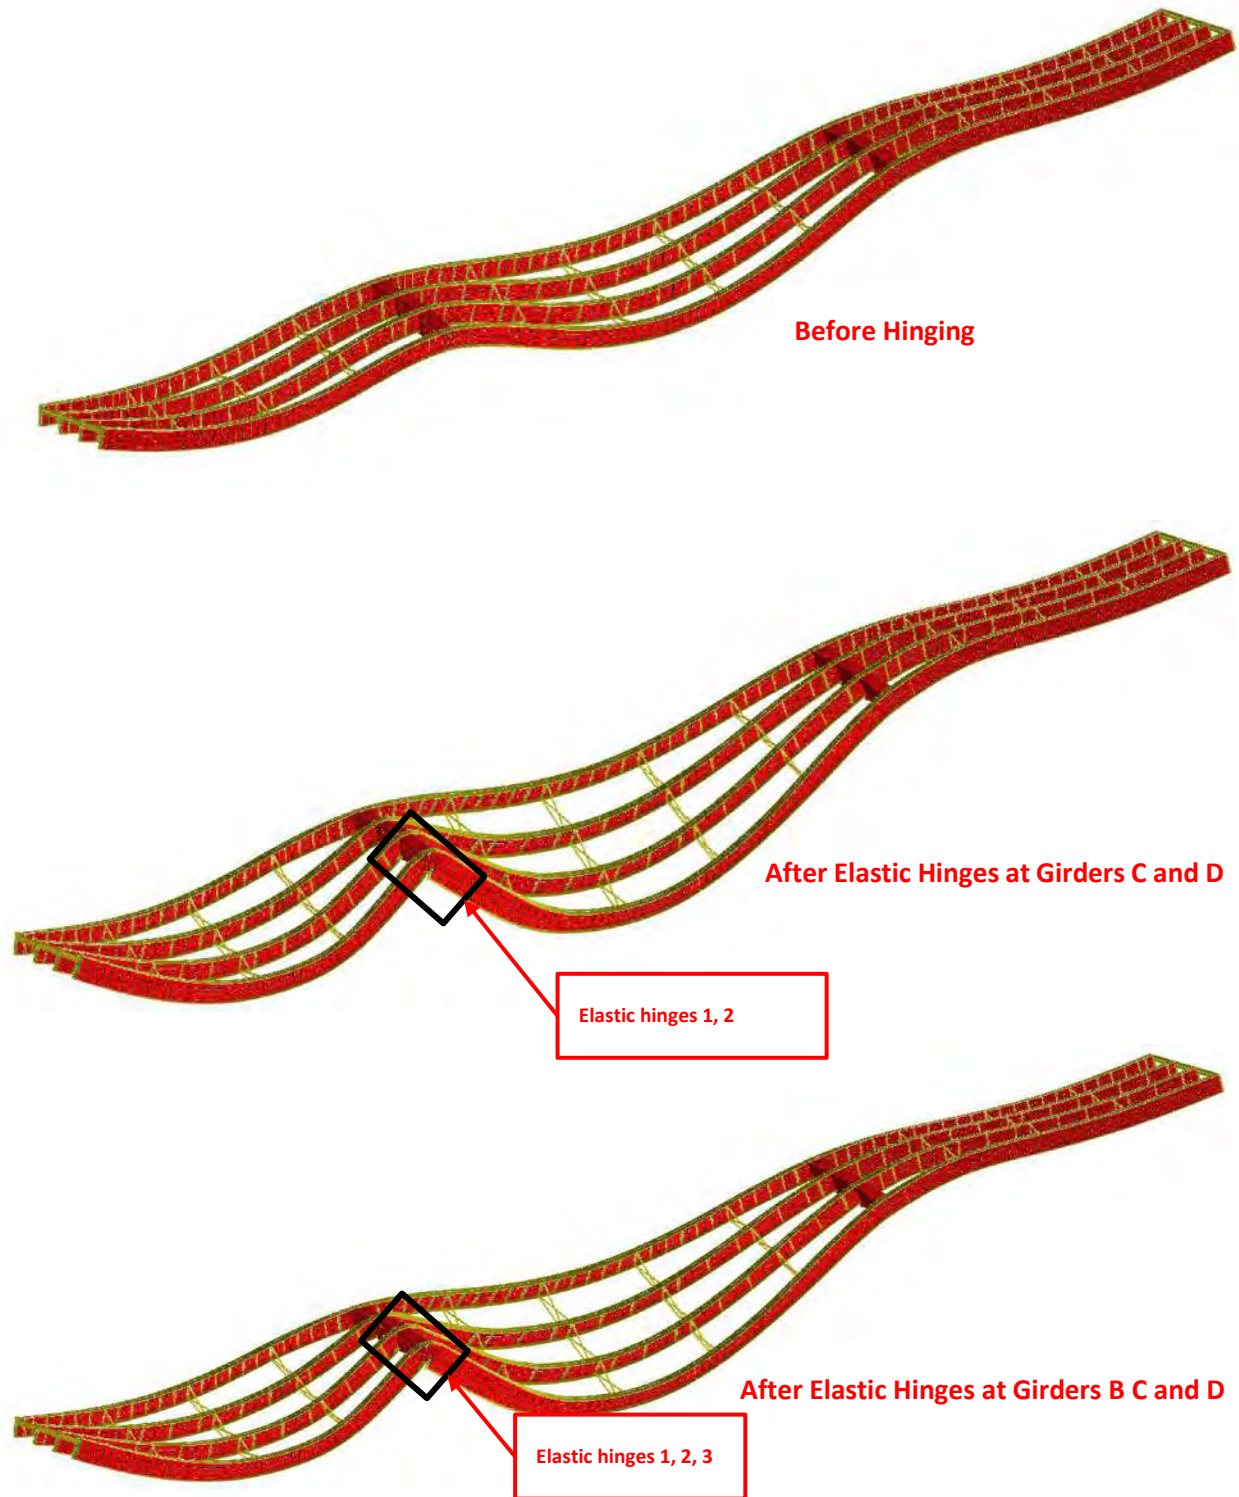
Progression of Failure at Pier Cap Under 3.5 x H-L93 Loading (deck not shown for clarity)
